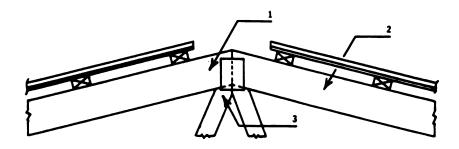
Location of test sites, Barn G. Truss No. 1, 13.4m (44') from east end. East elevation. Flashing not shown.
